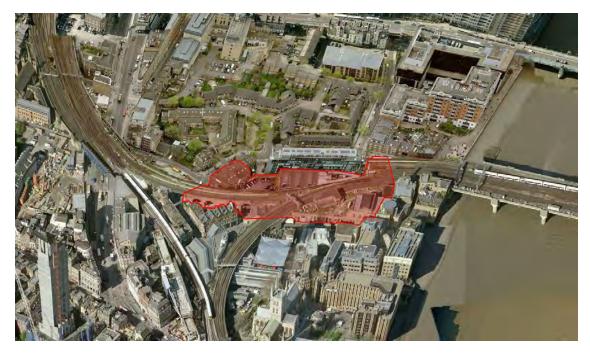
Redline Plan showing site boundary to the Borough Yards Mixed Used Development
